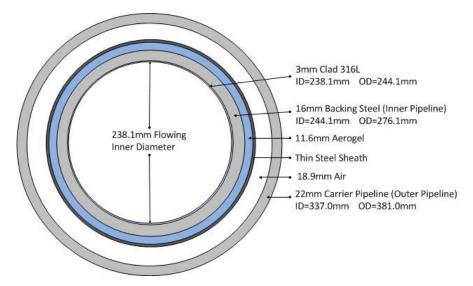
The Pipe-in-Pipe concept at Utgard (schematic sketch)
